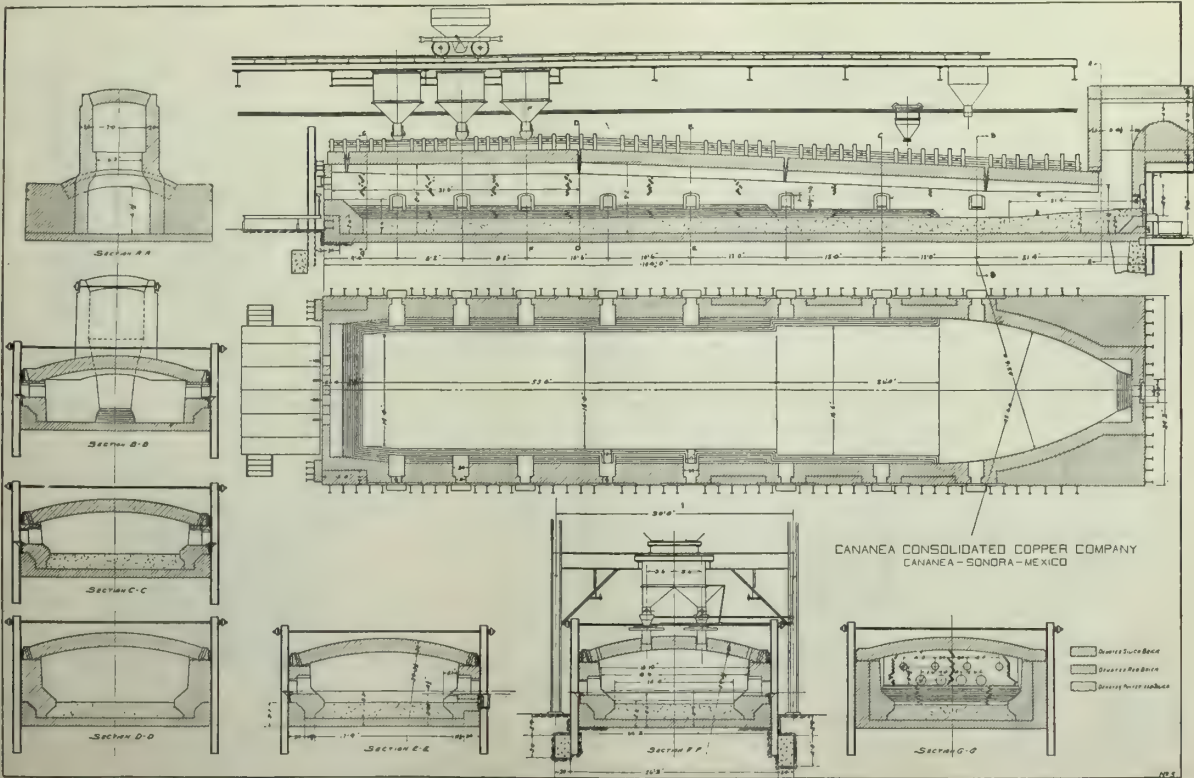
CANANEA OIL-FIRED FURNACE, PLAN AND SECTION.
